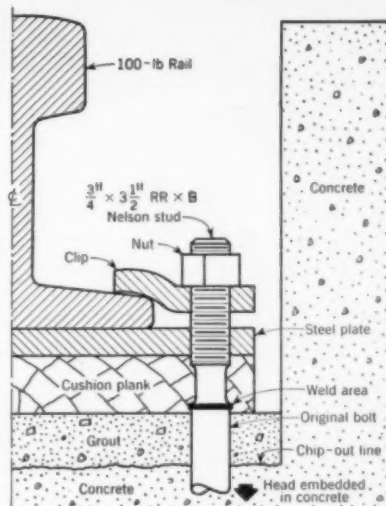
Threaded studs, end-welded with a Nelson gun to existing bolts embedded in concrete constitute the method used at the U.S. Naval Ammunition Depot, Earle, N.J., to replace railroad rails on their concrete piers at Leonardo.
